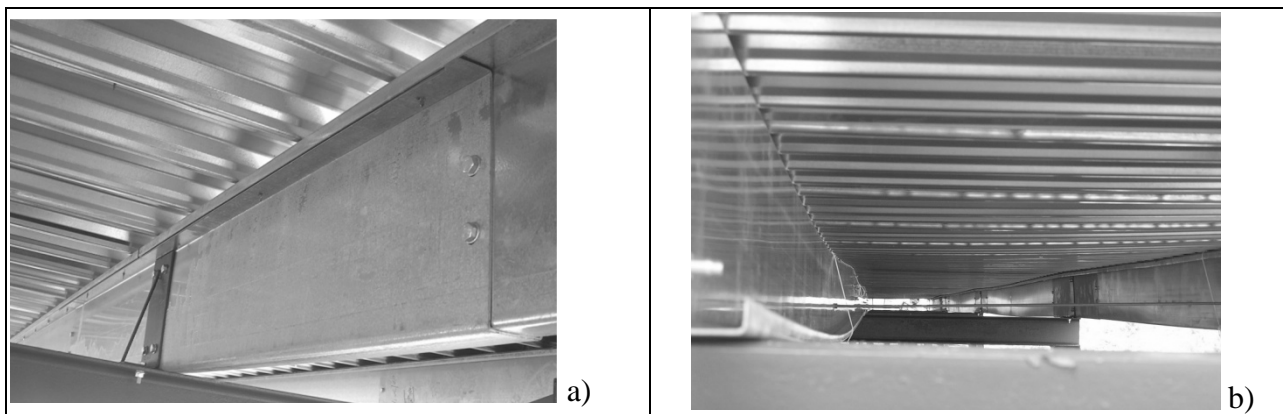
Bottom view of the cover: a) Undeformed shape. b) Deformed shape during the loading process
